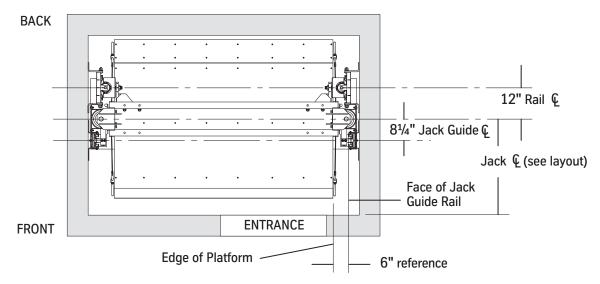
Jack Guide Rail Mounting Brackets to Jack Guide Rail Assembly
